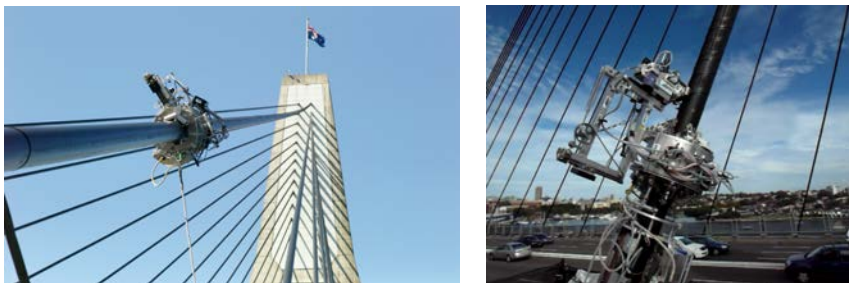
Fully automated welding for retrofit of helical fillets to improve cable aerodynamics and reduce rain-wind induced cable vibrations, Anzac Bridge, Australia, 2012. Left: Cable-powered welding robot travelling down while welding a helical fillet. Right: Detail of the modular welding robot consisting of linear transportation unit, rotating unit and welding device including PE extruder.
